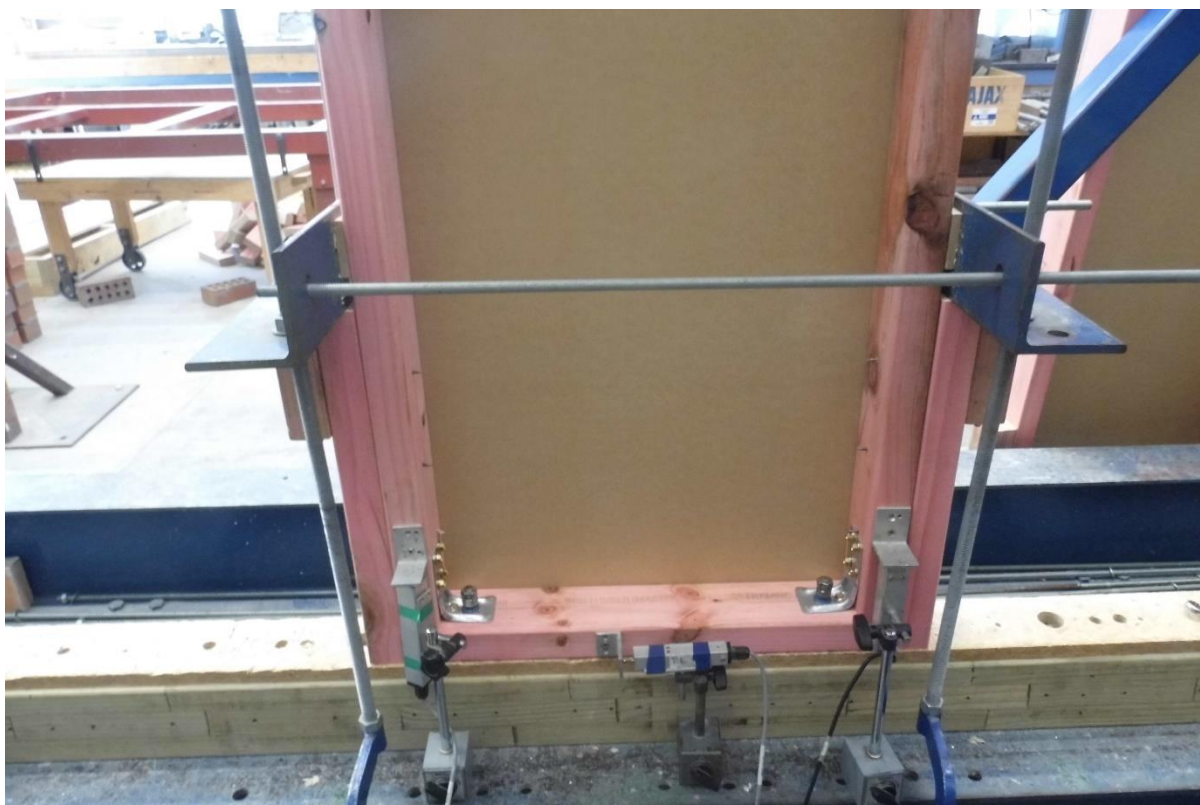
View of the bottom of a typical 600 mm specimen showing GIB® HandiBrac® hold-downs installed
